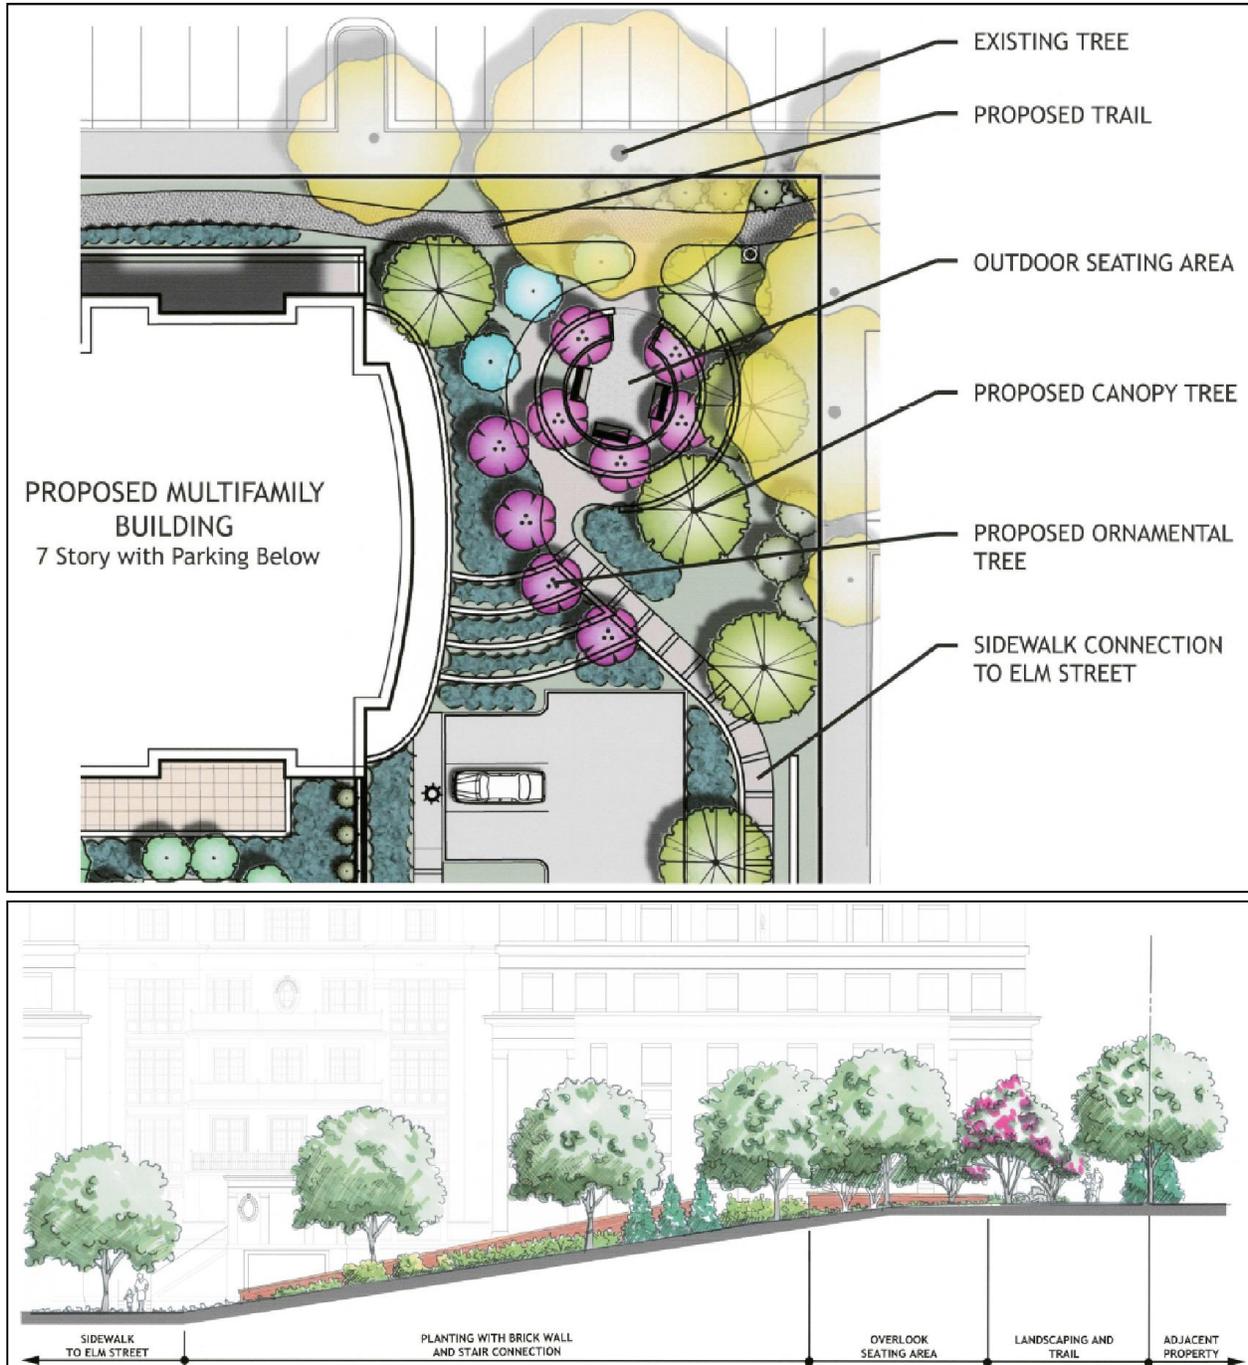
The applicant's design for the overlook terrace at the site's northwestern corner, with the corresponding cross section which demonstrates the grade changes from the southern end of the site on the left to the northern end on the right (Source: Bowman Consulting and Niles Bolton Associates, June 1, 2014)
